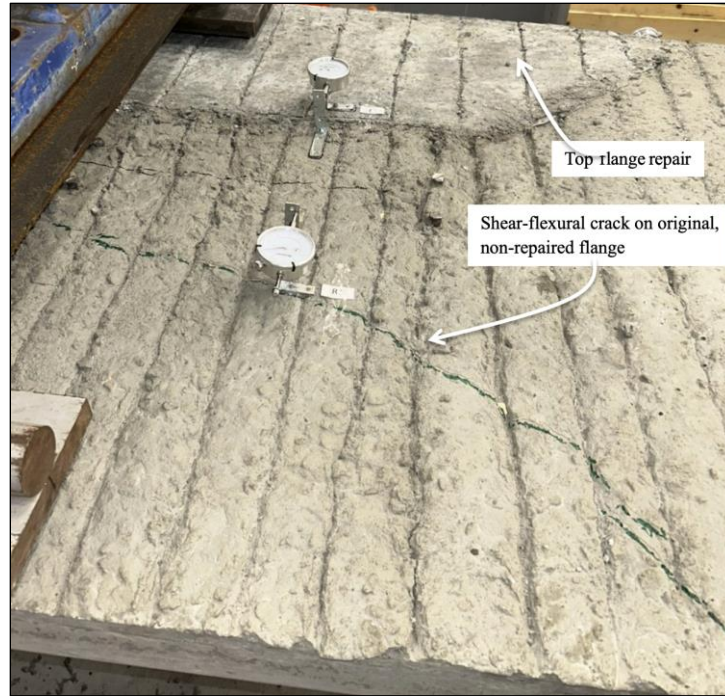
Photo. Test 1.3.F (repair 1.2LTF) shear-flexural cracks at 13.5 kip (right face of girder pictured, south end).
